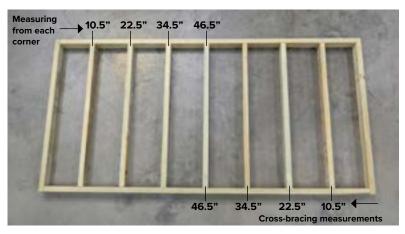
Your finished frame, also showing the measurements needed to mark for your cross-bracing.
